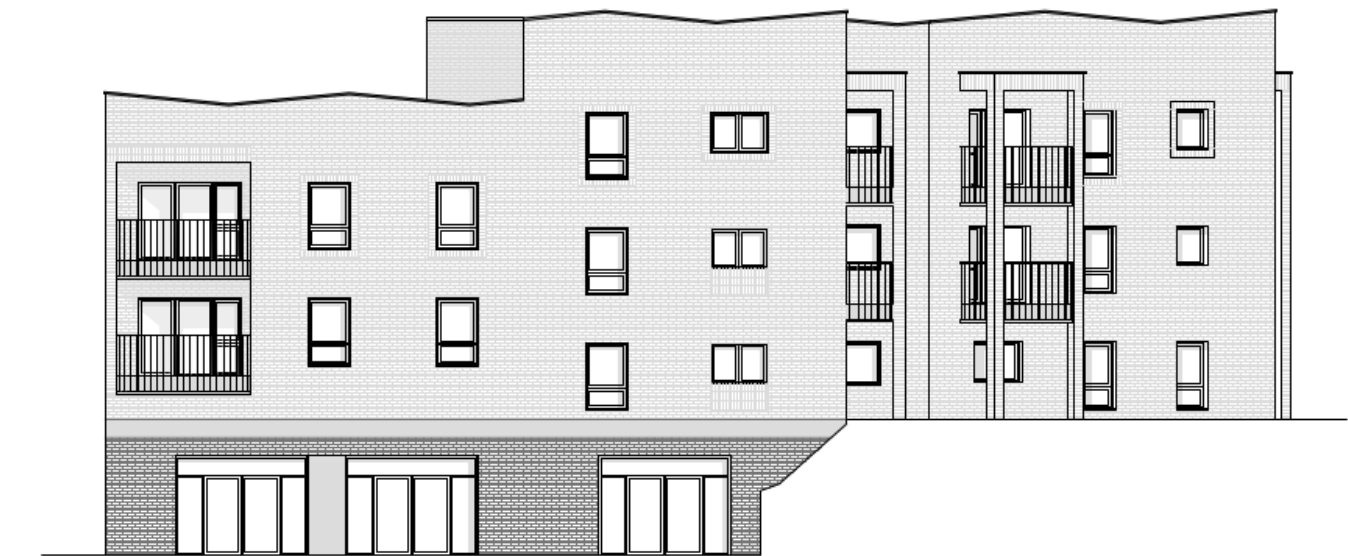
South Elevation of the proposed West Pavilion Portslade Village Centre Development
